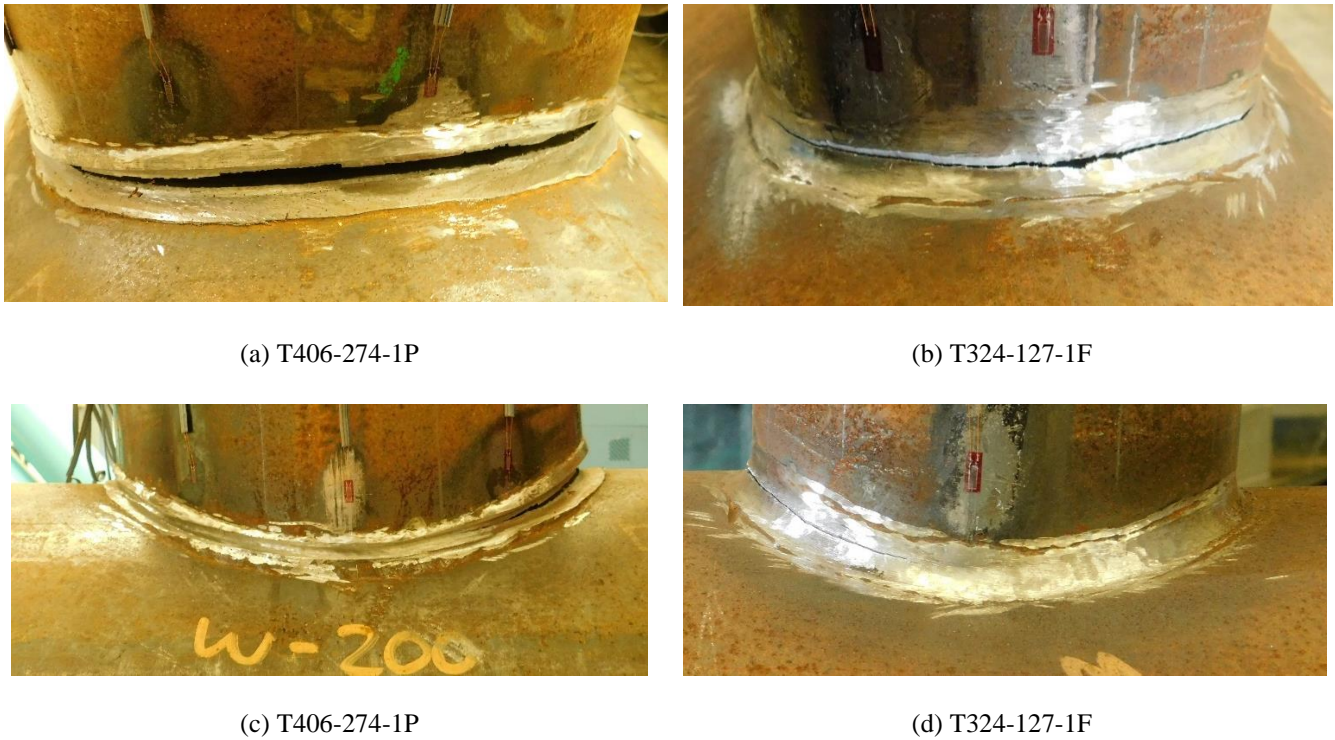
Typical weld fractures (*two-column figure*)
